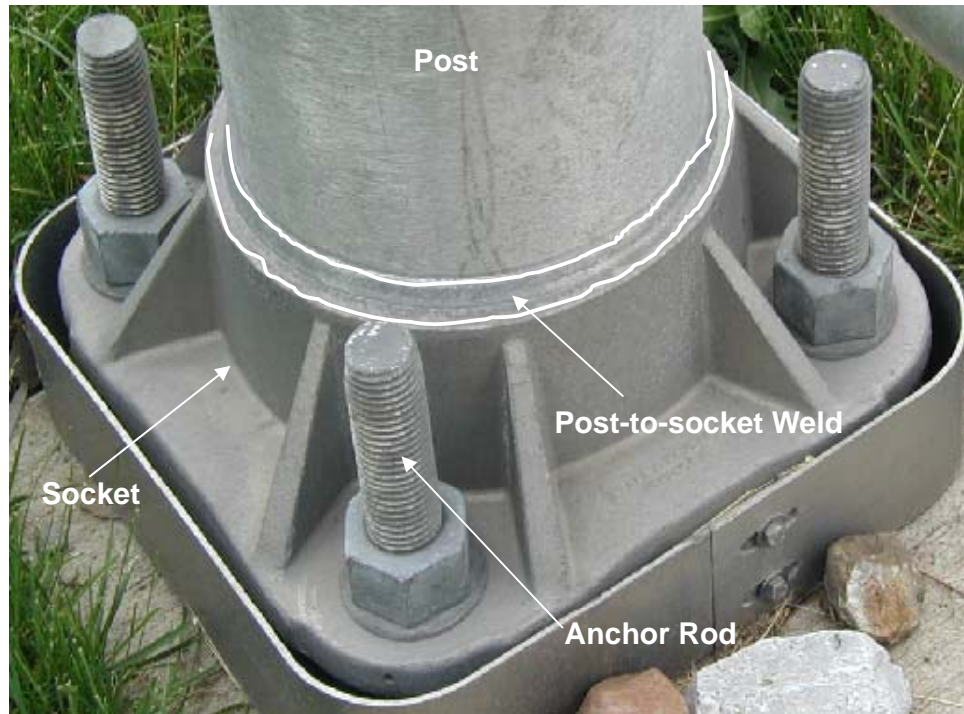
Post-to-socket weld connection and anchor rod for the box-truss sign structure.
